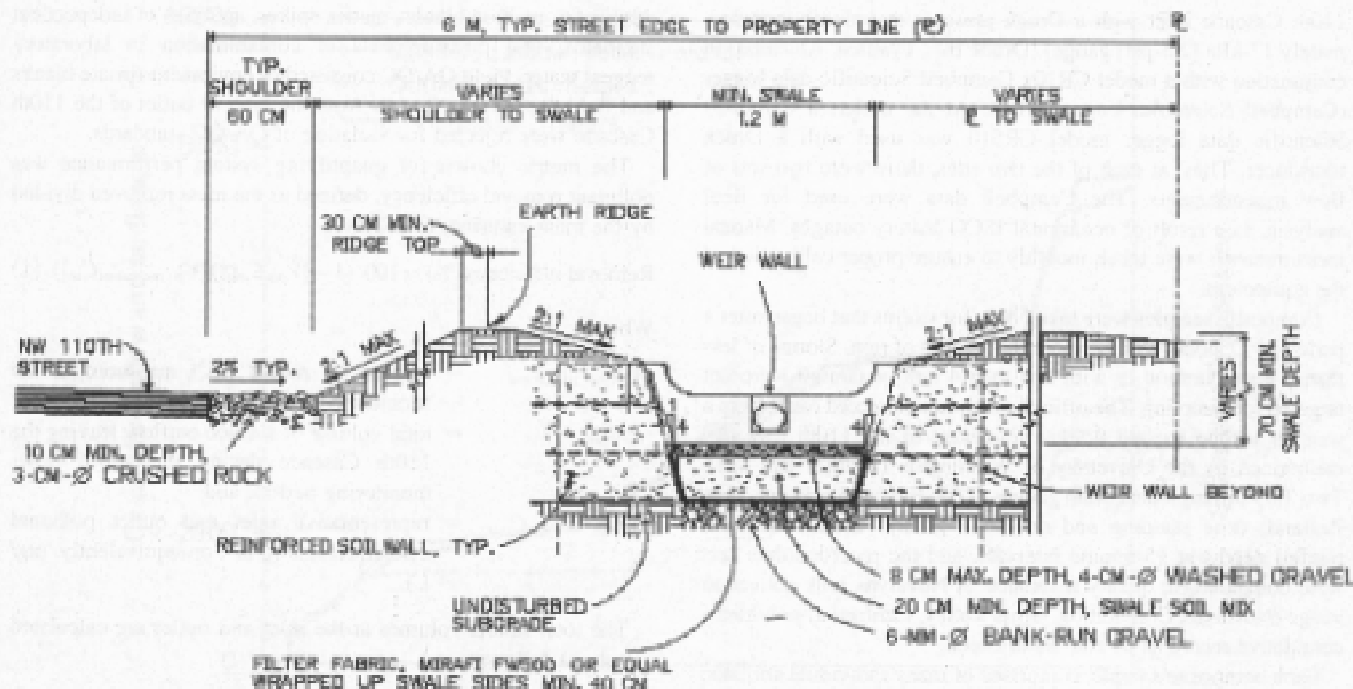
Typical NW 110th Cascade section looking downstream toward weir wall.
